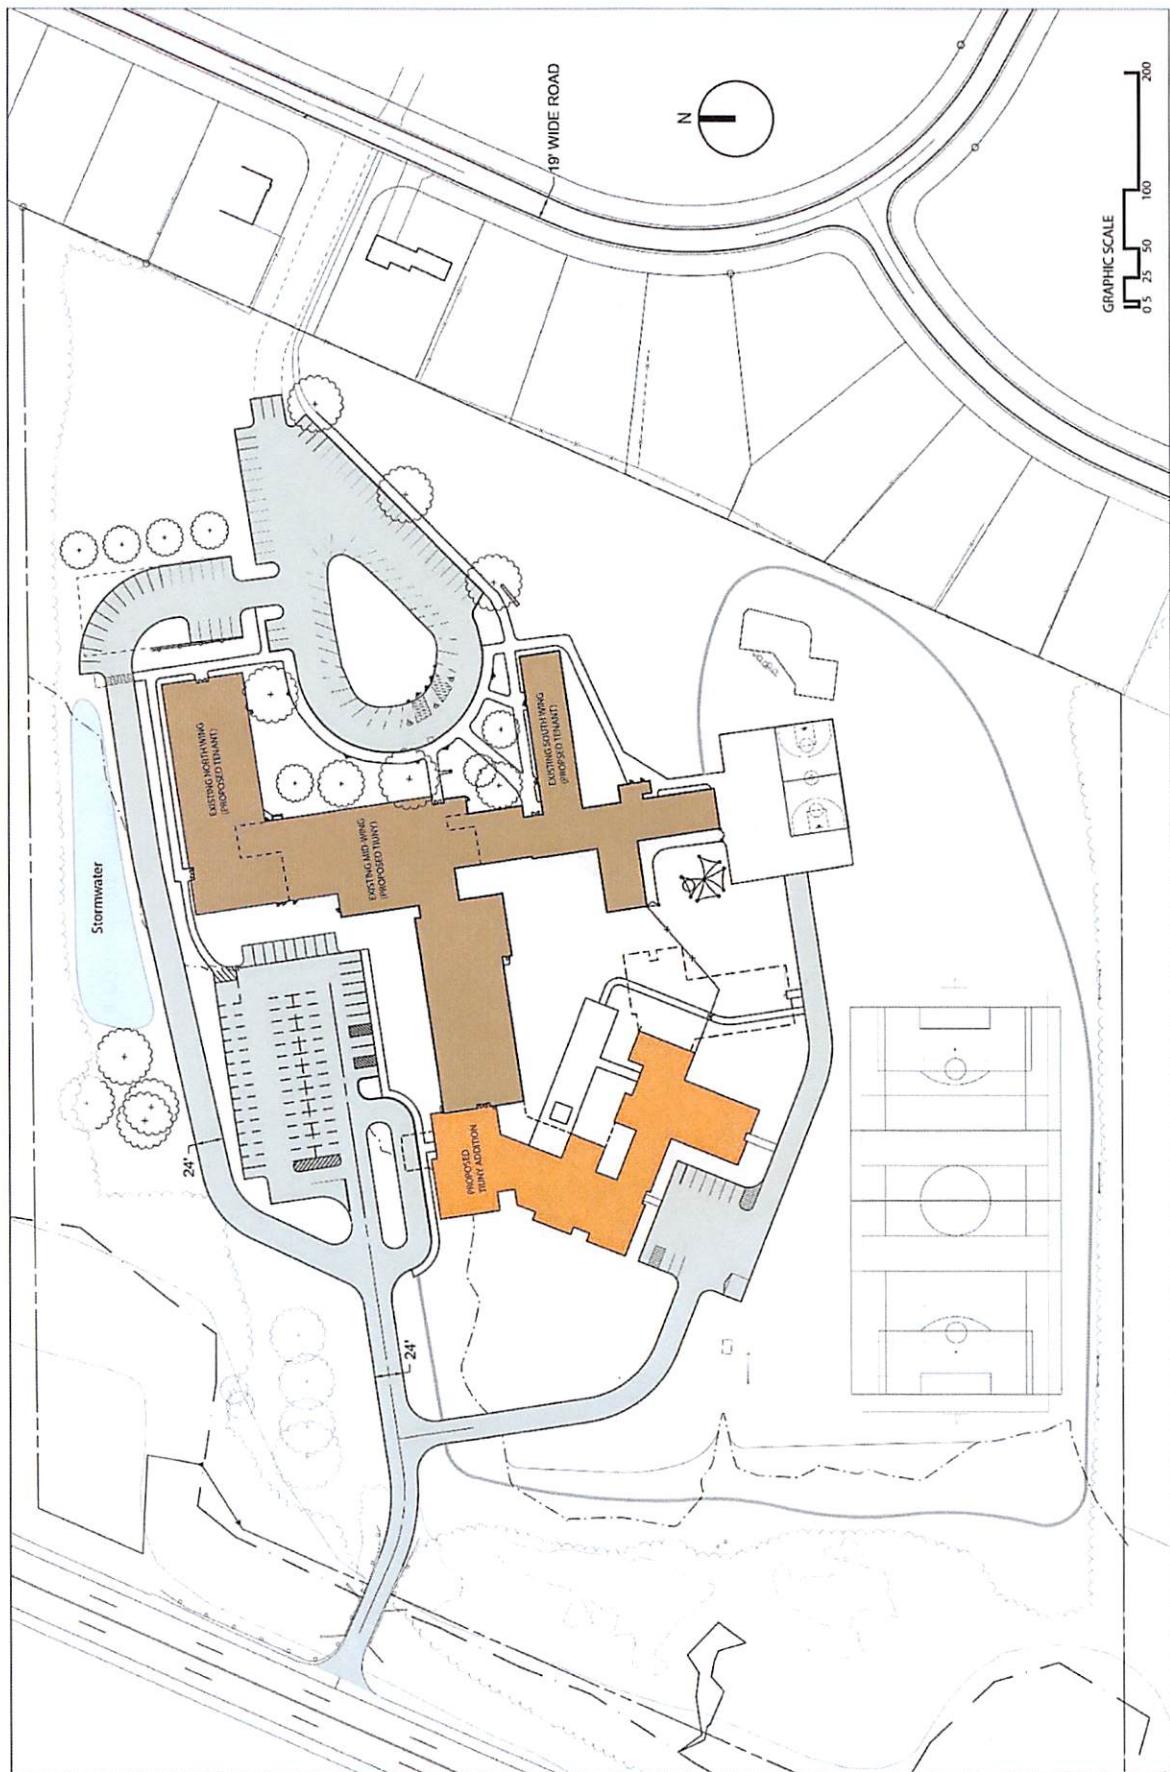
Proposal to close the Idlewood vehicle entrance and add a connecting driveway to the north of the building
